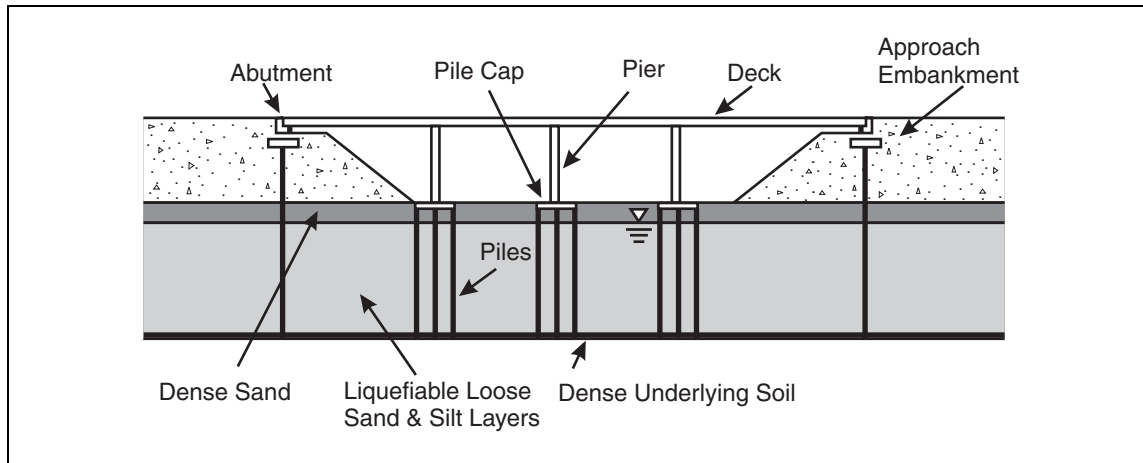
Elevation view of a representative bridge on a liquefiable stratum.
